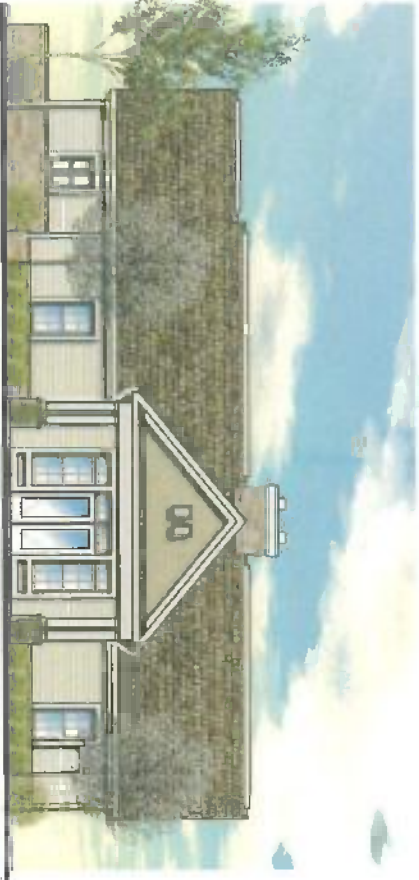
& F-2" - Architectural Elevations and Lighting
